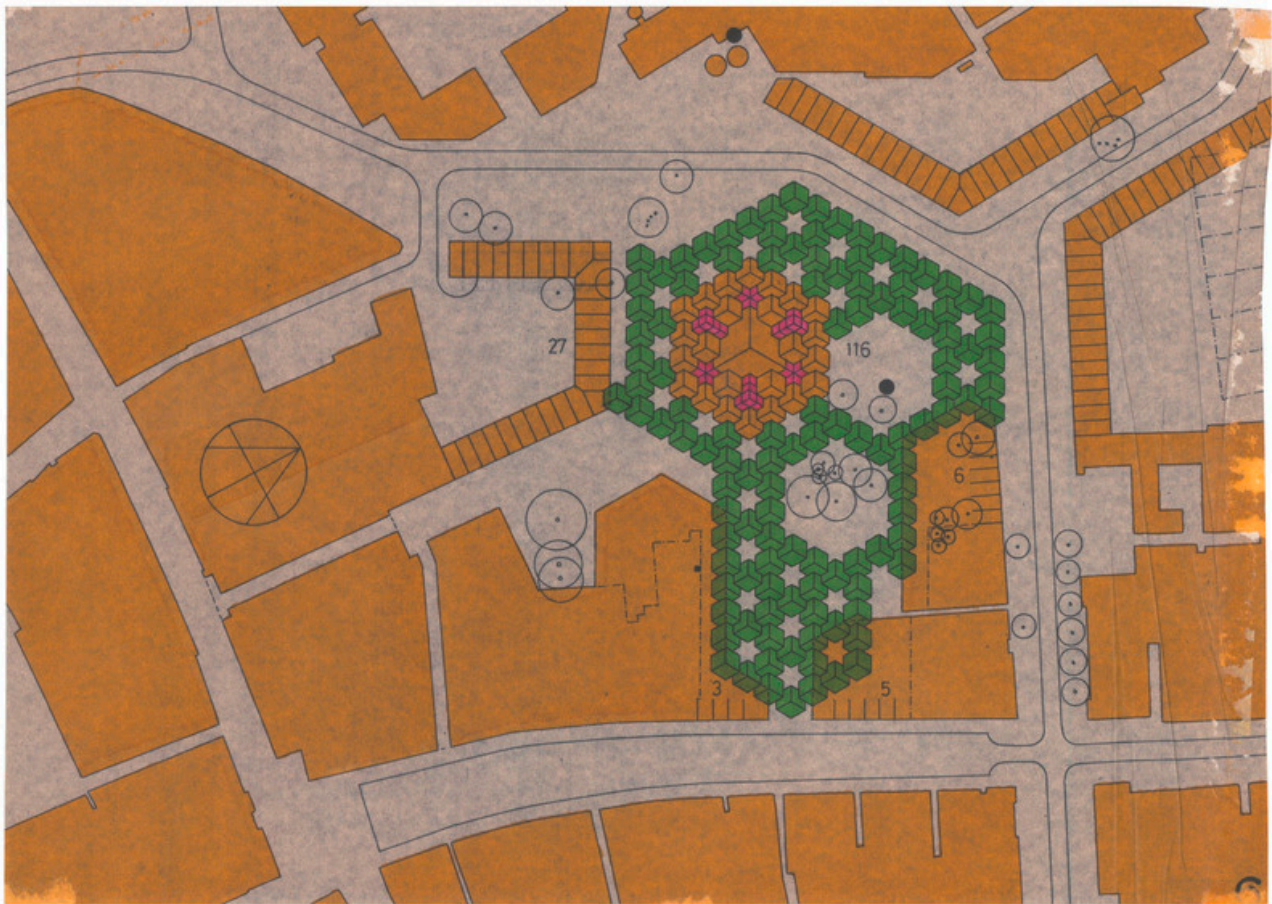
Piet Blom, Zoning plan of Het Speelhuis (163 dwellings) (HNI)
